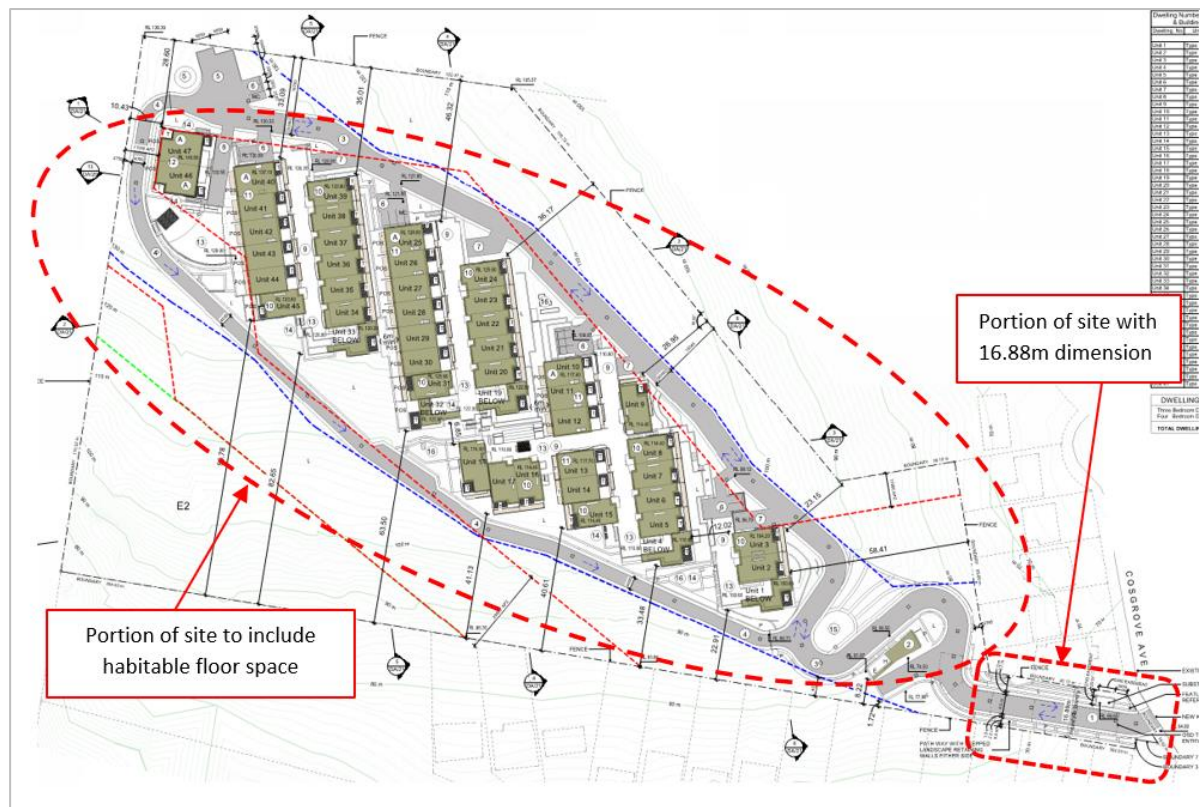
Extract of site plan demonstrating extent of variation (Source: Edminston Jones Architects)
